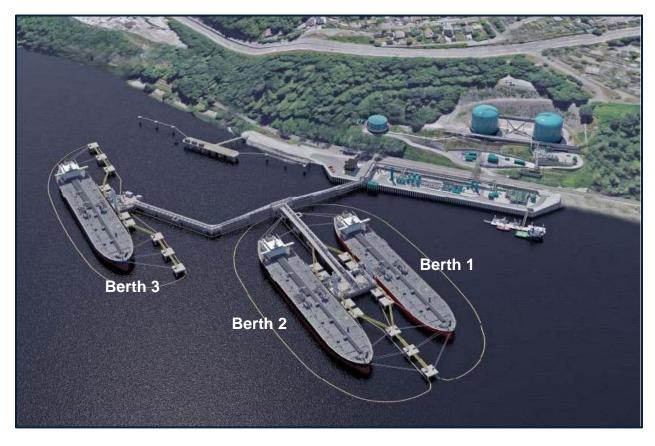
ARTIST RENDERING OF THE PROPOSED WESTRIDGE TERMINAL EXPANSION
